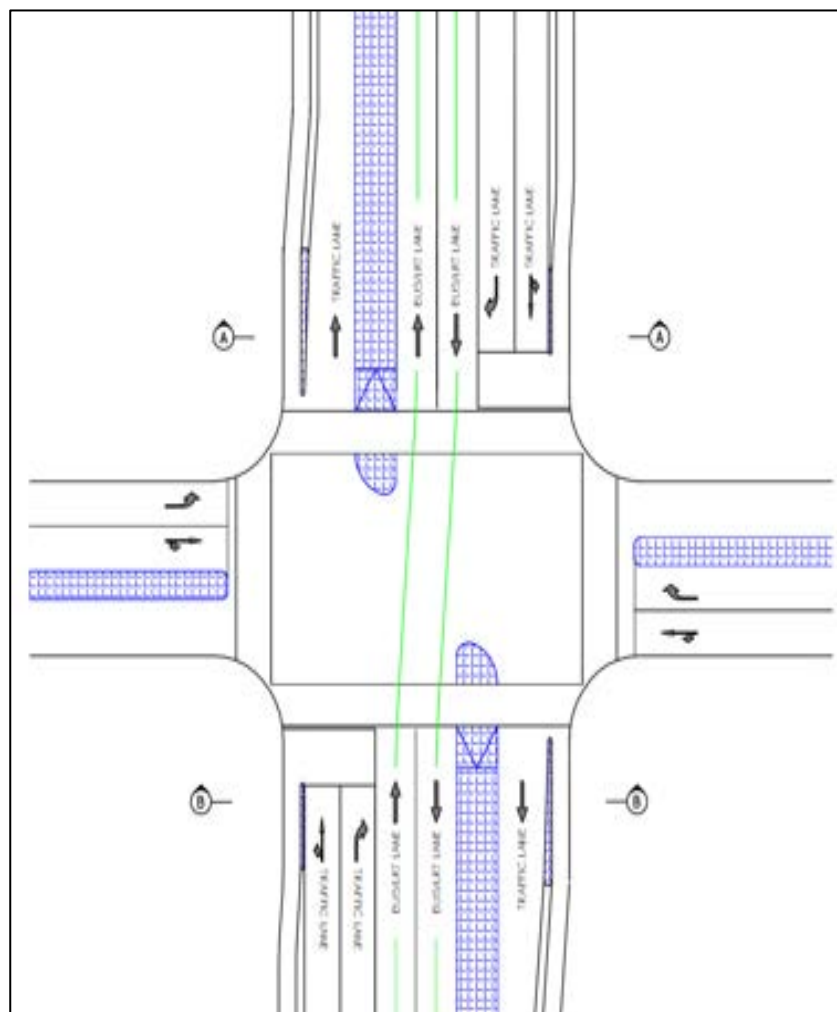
shows an indicative concept plan for transit stop locations west of St Brigids Terrace, that are proposed to be located at signalised intersections. Far side transit platforms are proposed. On the near side of the intersection potential right turn lanes are proposed to permit safe right turning and provide acceptable intersection capacity.
